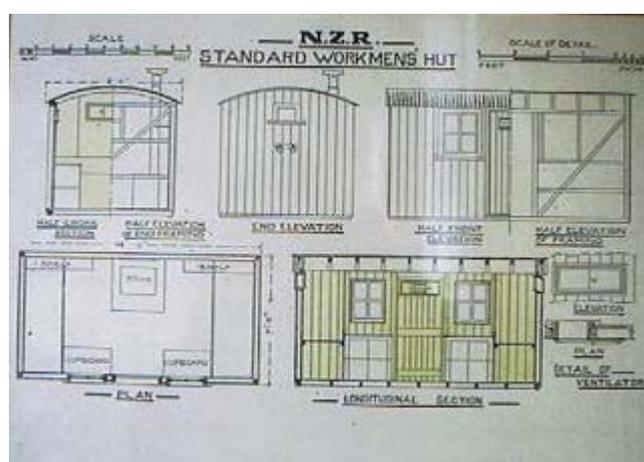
Drawings showing plan, elevations and sections of the standard workmen's hut (New Zealand Rail <http://www.mas-des-saules.co.nz/shepherds-huts-history.html>).
